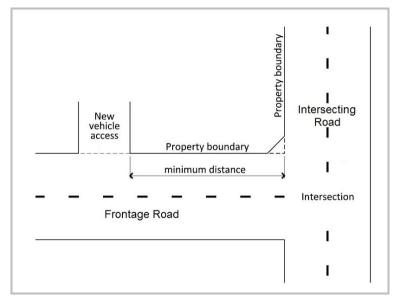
Christchurch District Plan - Figure 16 - Minimum distance of vehicle crossing from intersections outside the Central City
